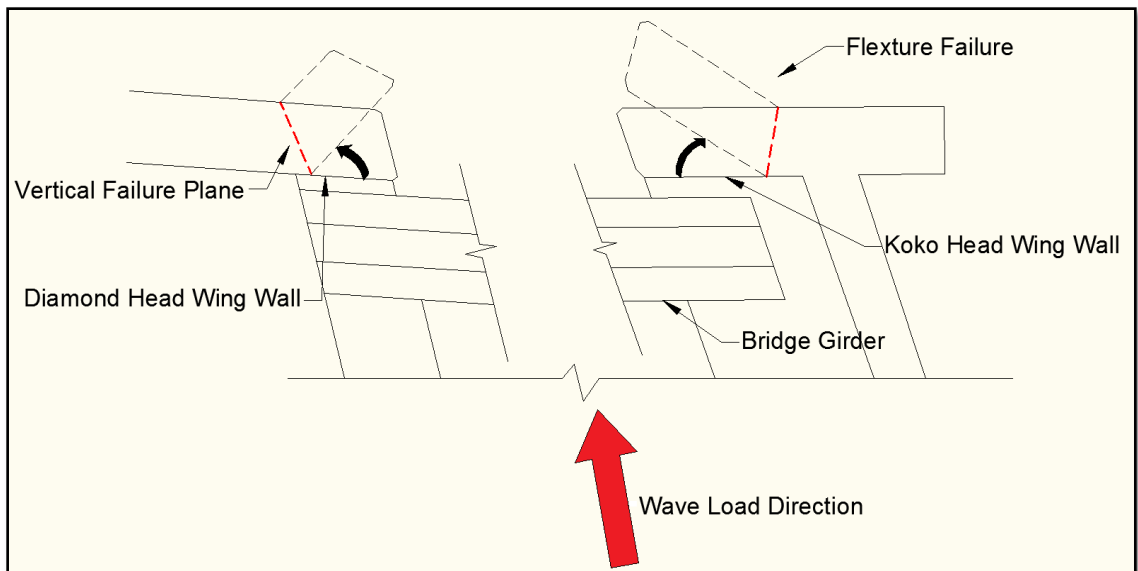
Wing Wall Vertical Failure Plane (plan view)
